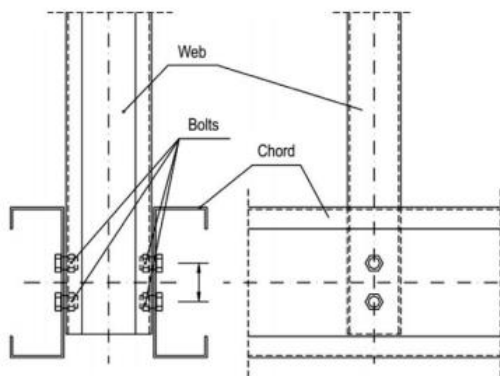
CFS truss bolted connection (Zaharia and Dubina, 2006)
